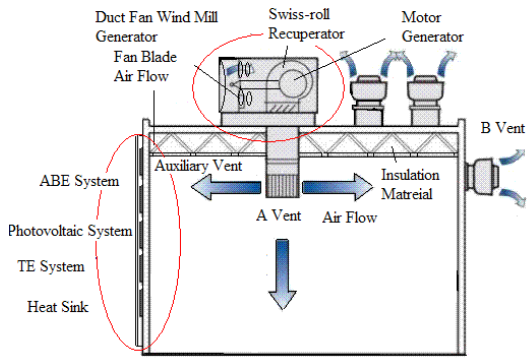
Active building envelope (ABE) system with ventilation effect (Fan) [13]
